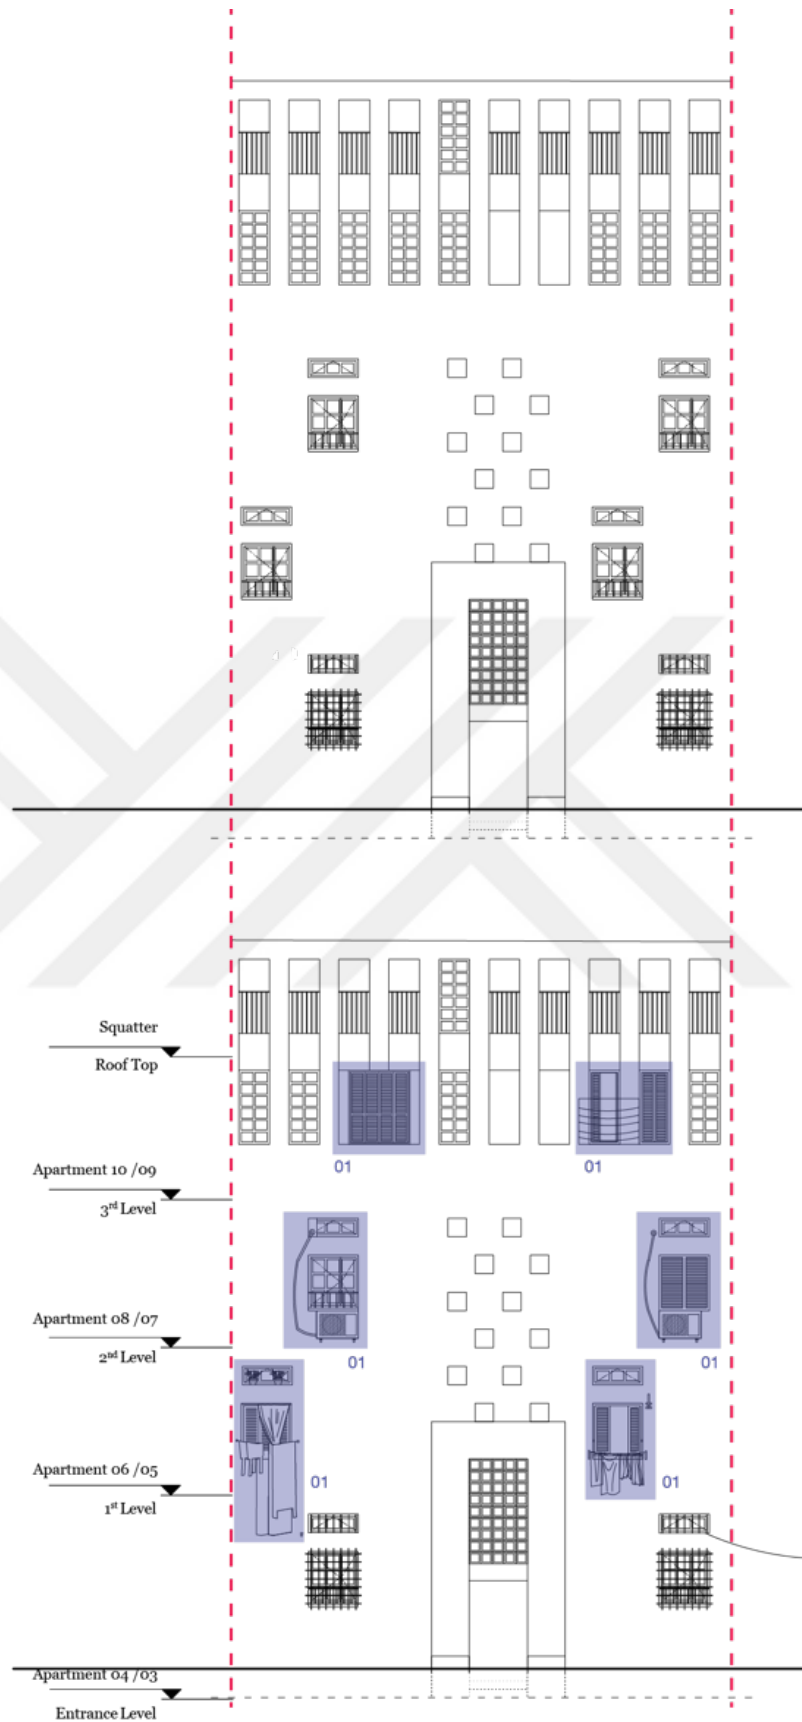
Original (top) and modified (bottom) façade drawings of Block 24. Residents modifications are highlighted on the modified façade (bottom).
